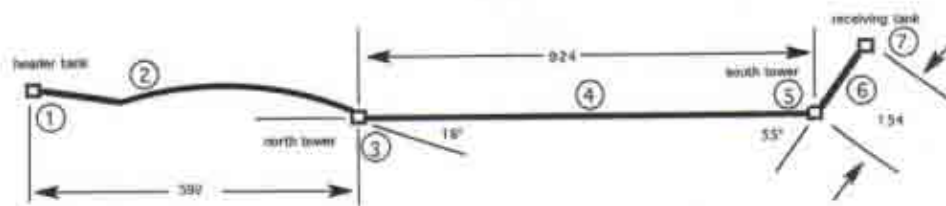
Plan of Aspendos siphon. 1 - Header tank; 2 - Low venter bridge; 3 N tower; 4 - Large venter bridge; 5 - S tower; 6 - 2-tier venter bridge; 7 - Receiving tank. Distances in meters.
